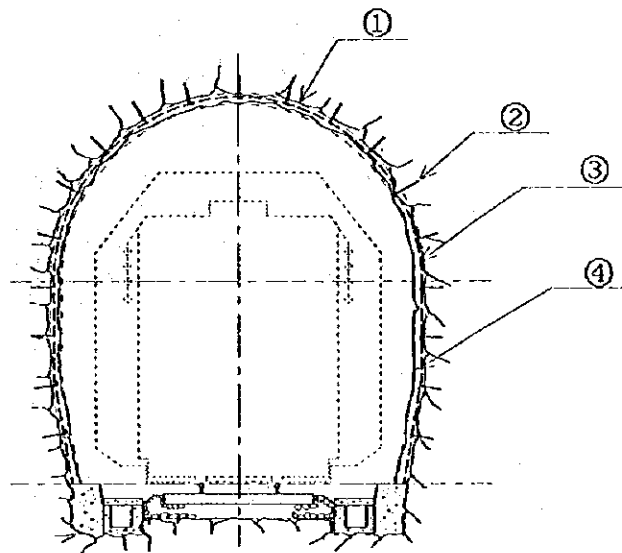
Type 3 Tunnel Improvement Method
